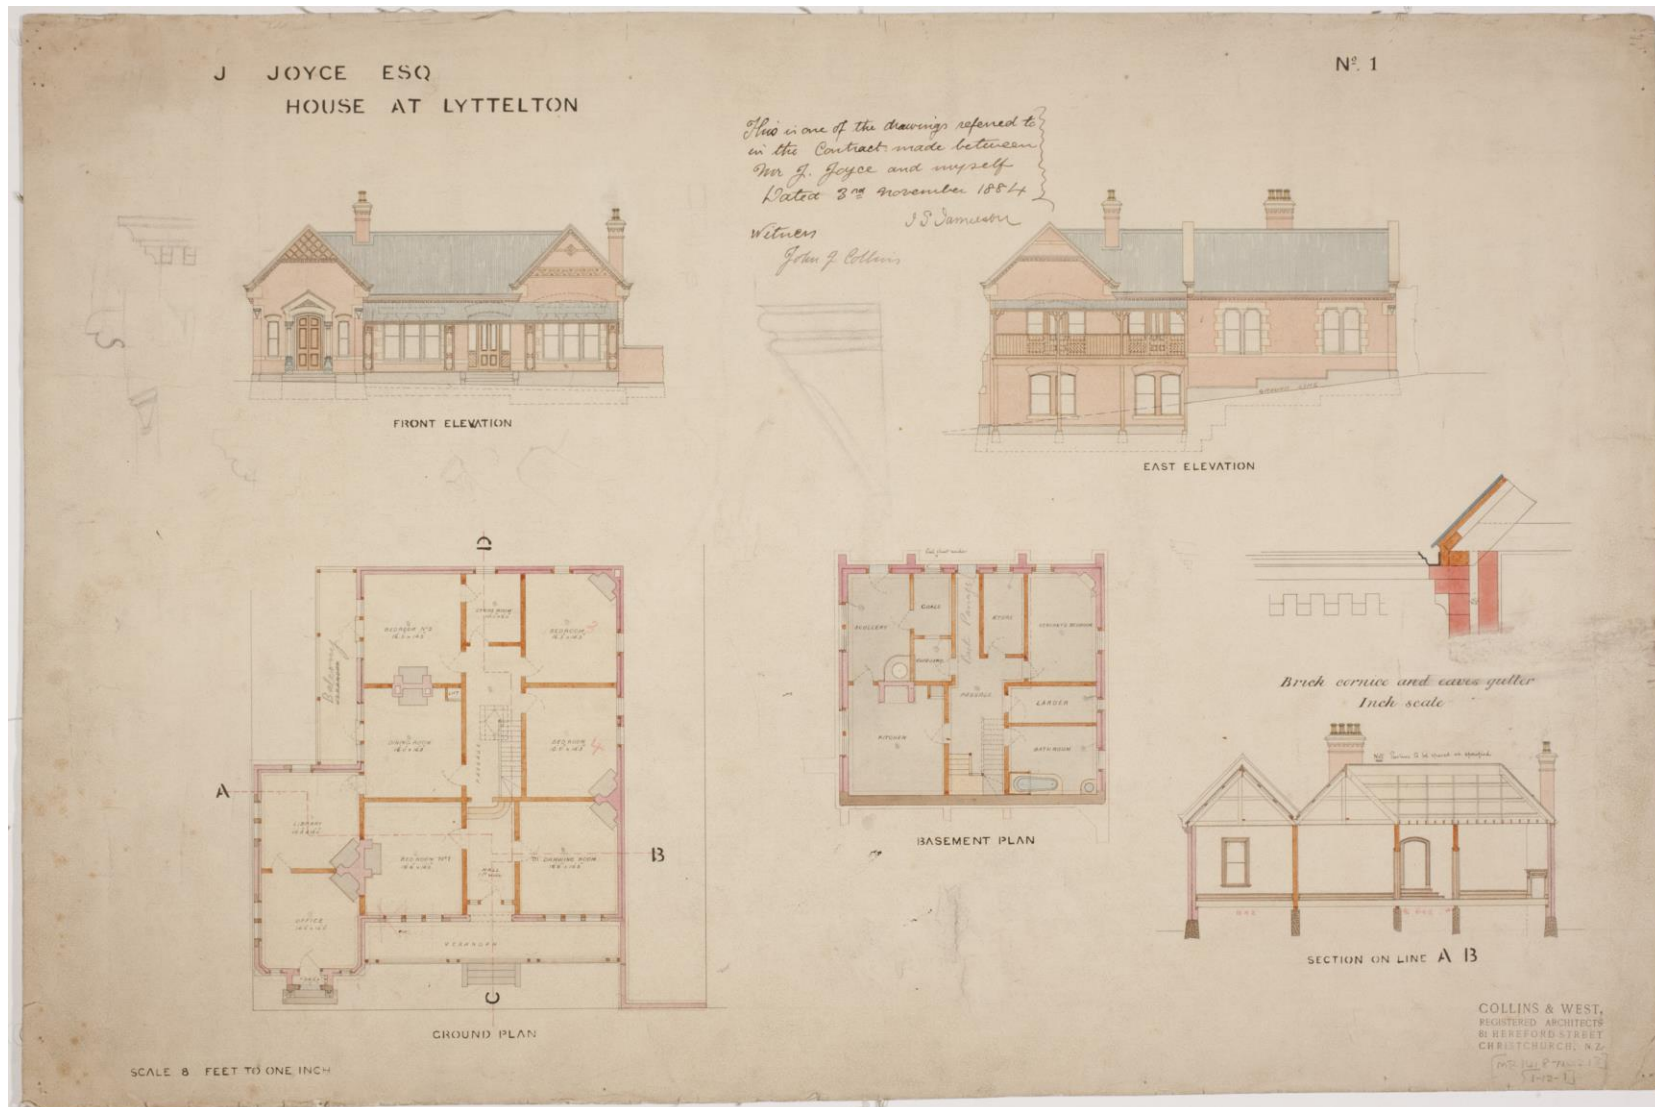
Collins and Harman, J. Joyce, Esq., House at Lyttelton, plans, elevations and section (1884).
